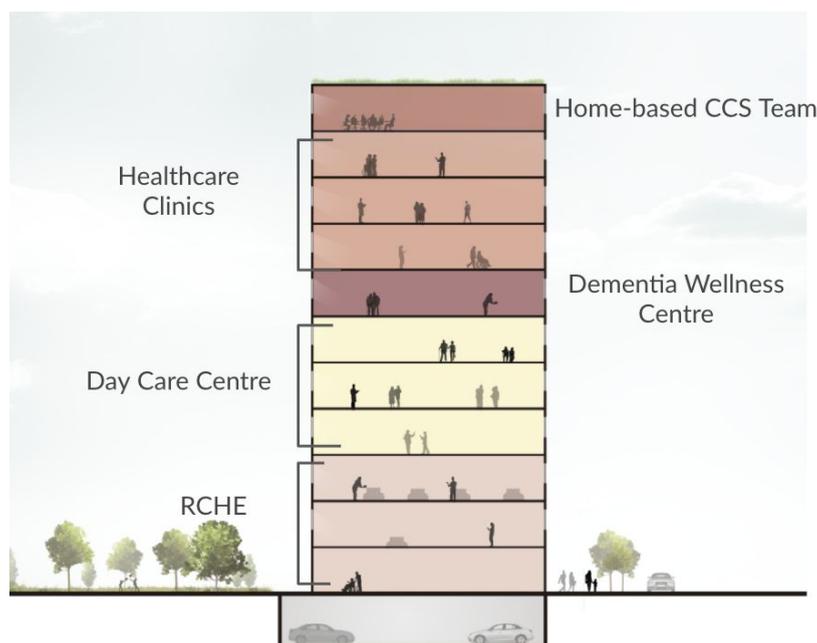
Section of Multi-level Healthcare Composite Building (Source: Study Team)
